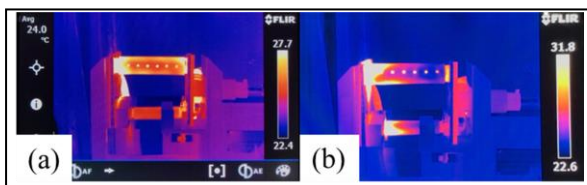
Thermographs of (a) undamaged and (b) corroded cable samples.
